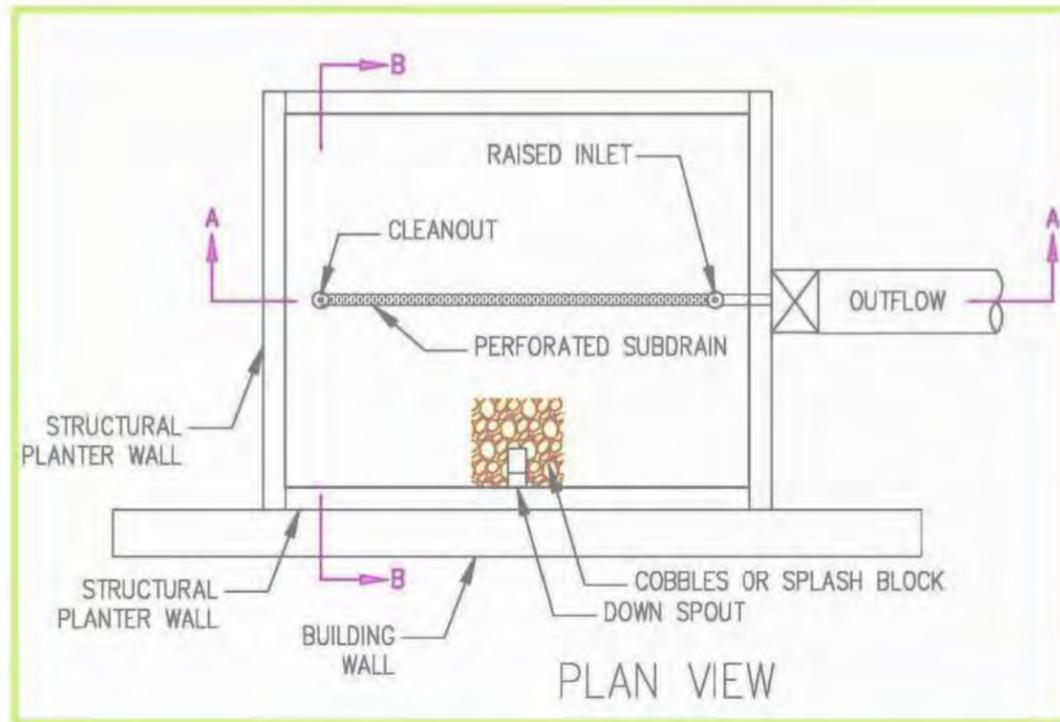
Plan view of planter designed to disperse flows adequately with only one inlet to planter
